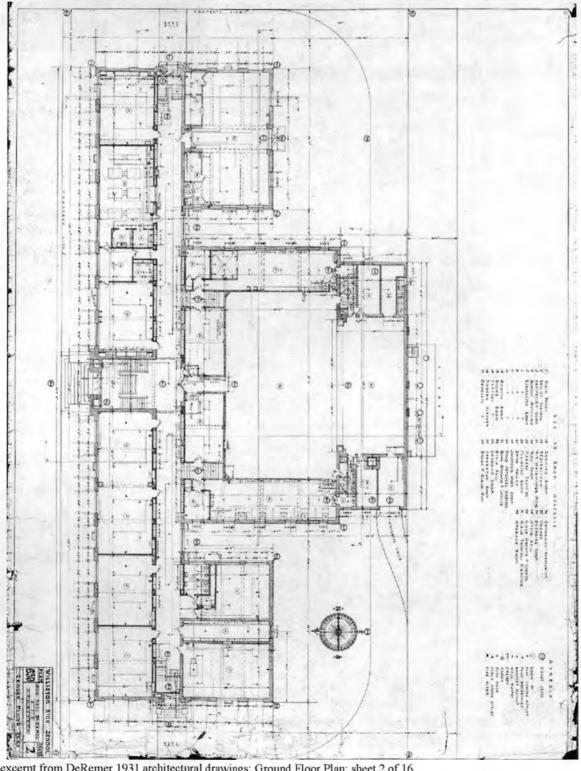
excerpt from DeRemer 1931 architectural drawings; Ground Floor Plan; sheet 2 of 16
